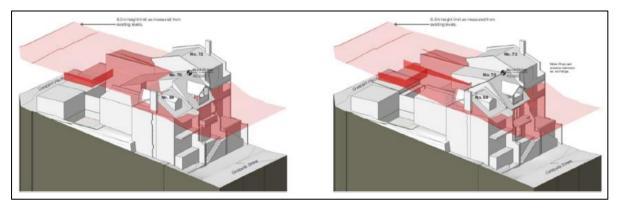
Height Plane Diagram for the existing (Left) and proposed (Right) sites.
